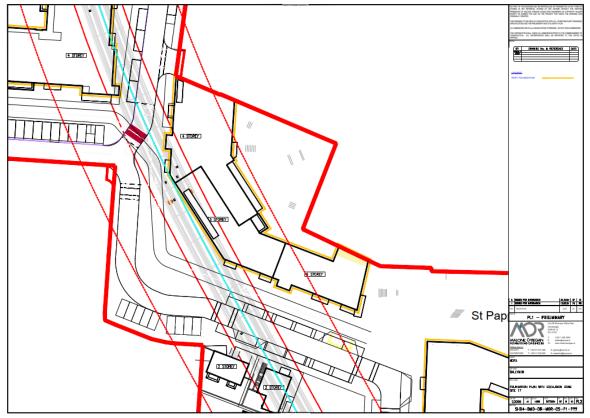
Foundation Plan with Exclusion Zone Site 17
